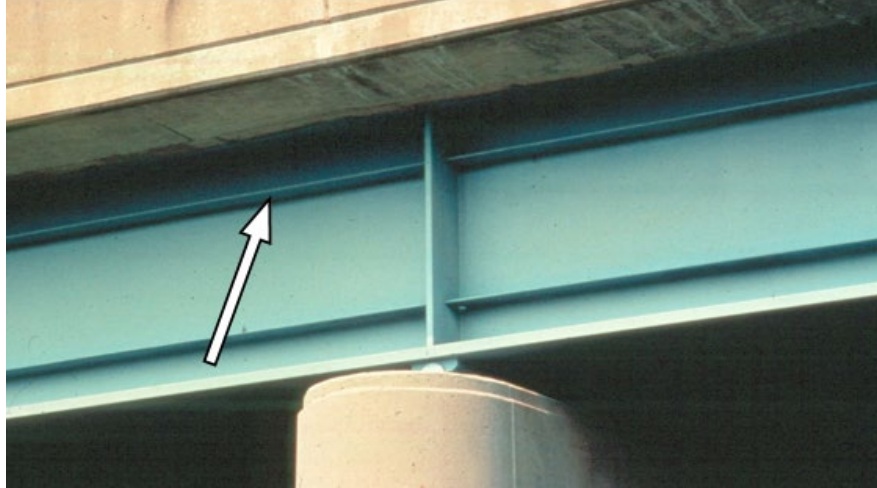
Longitudinal Stiffener in Tension Zone on a Plate Girder Bridge
